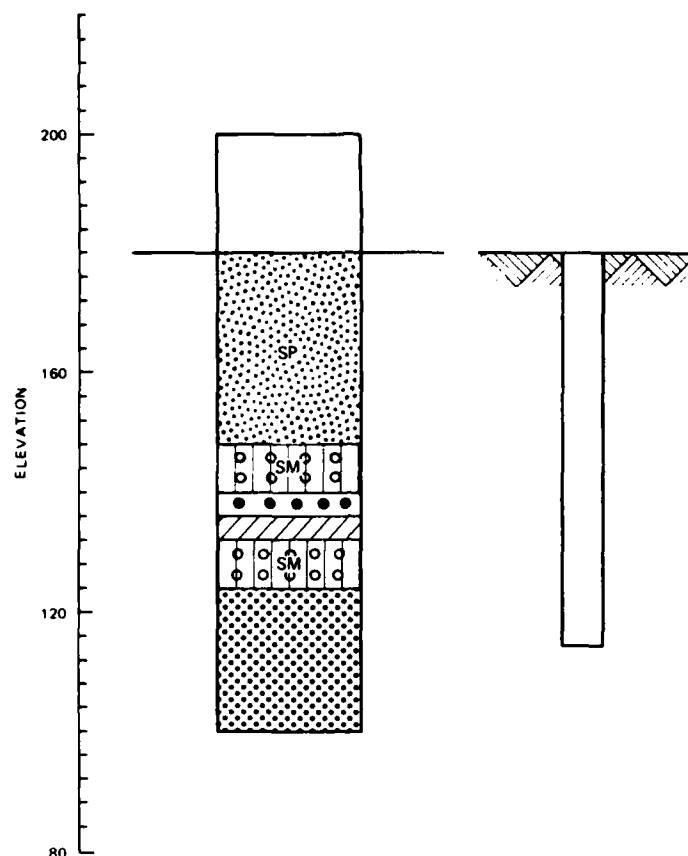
Generalized soil profile for Lock and Dam No. 4 pile test site
